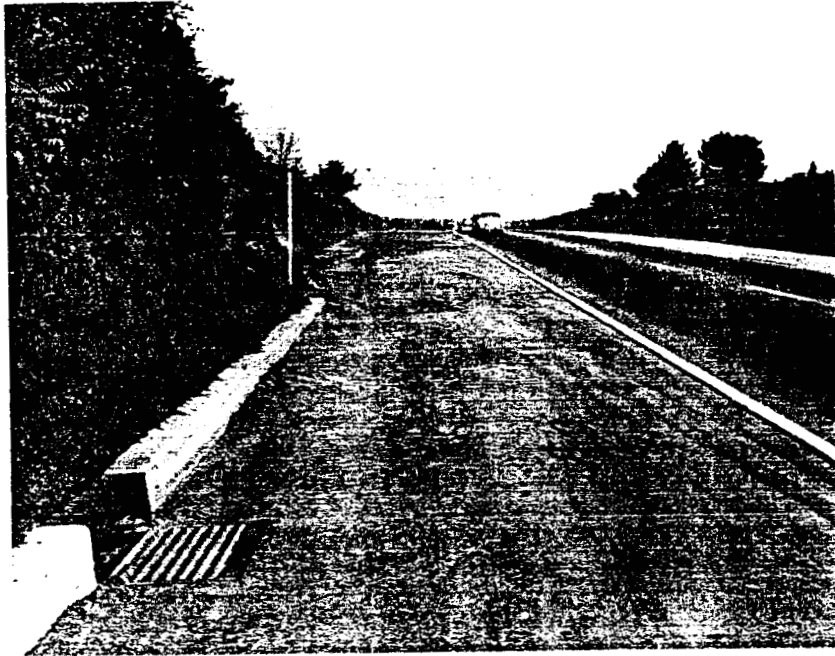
Route 78 westbound @ M.P. 22-23. Condition of a road's shoulder sloping toward an inlet in a cut section.
